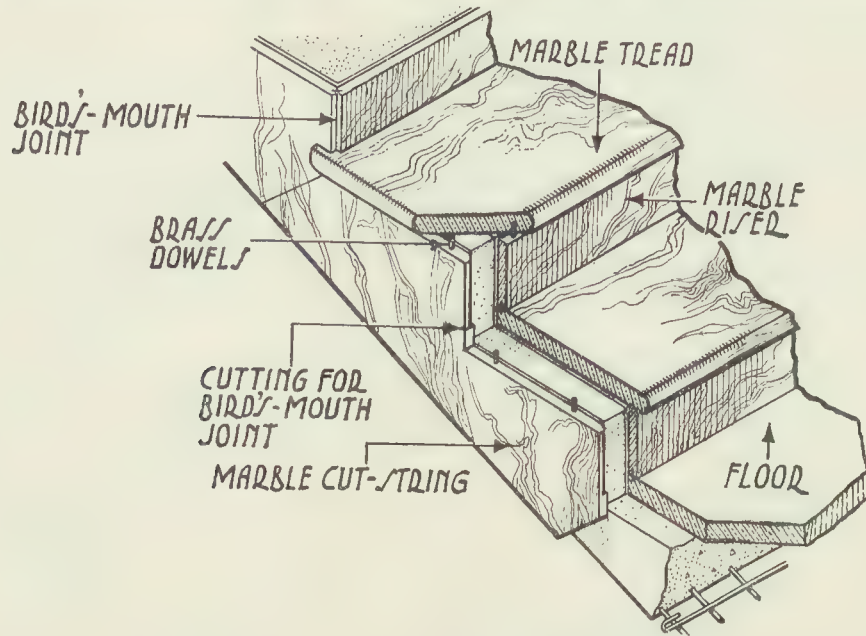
MARBLE COVERING TO CONCRETE STAIRS
